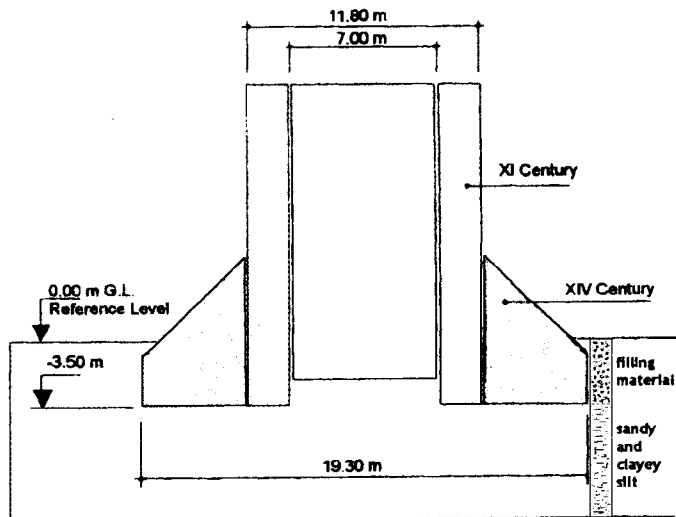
Foundation structure of the bell tower and sub-soil profile.
